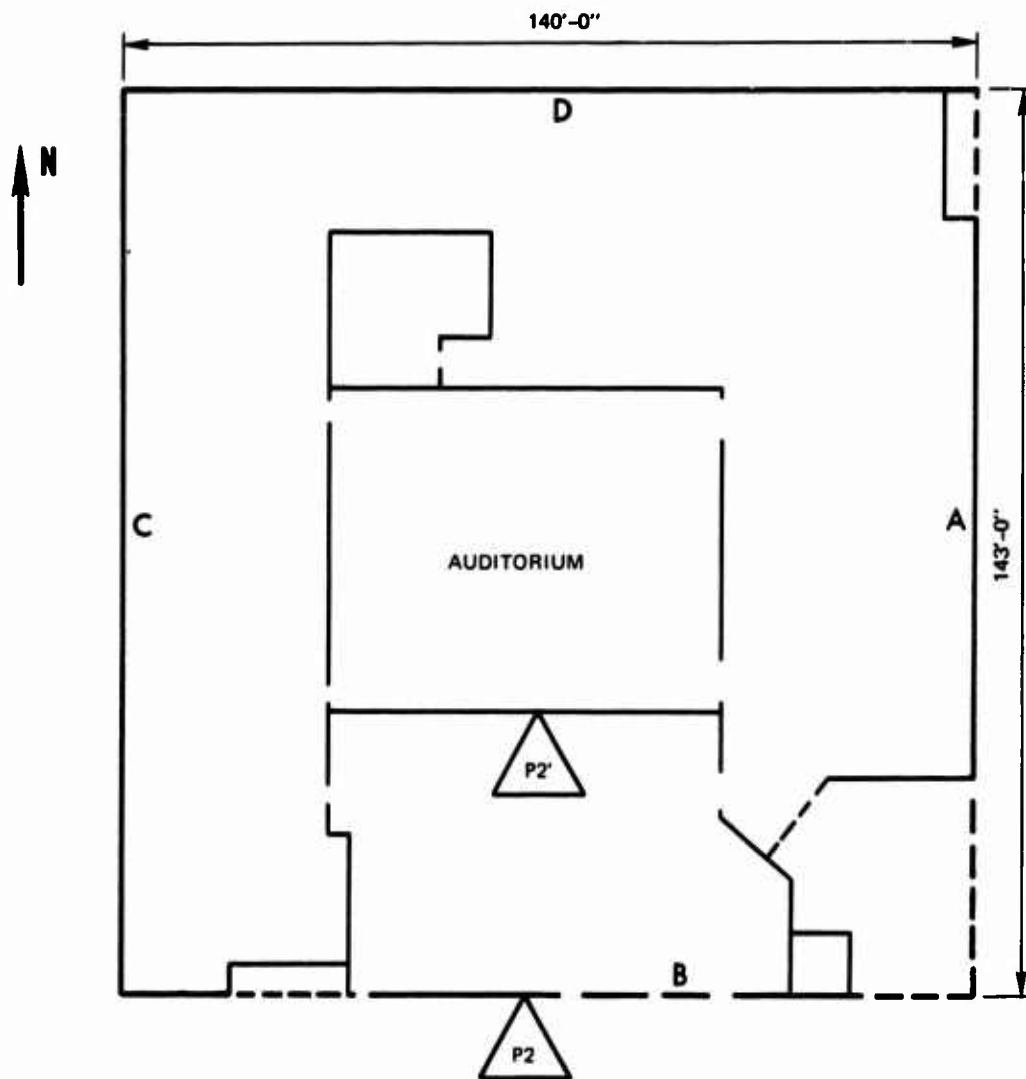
PLAN VIEW OF INTERIOR WALLS ON SECOND STORY
